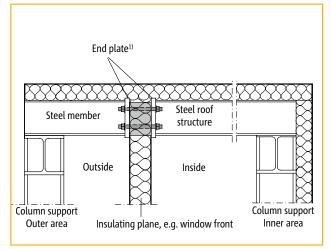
Schöck Isokorb® type KST for separation within the structural system
